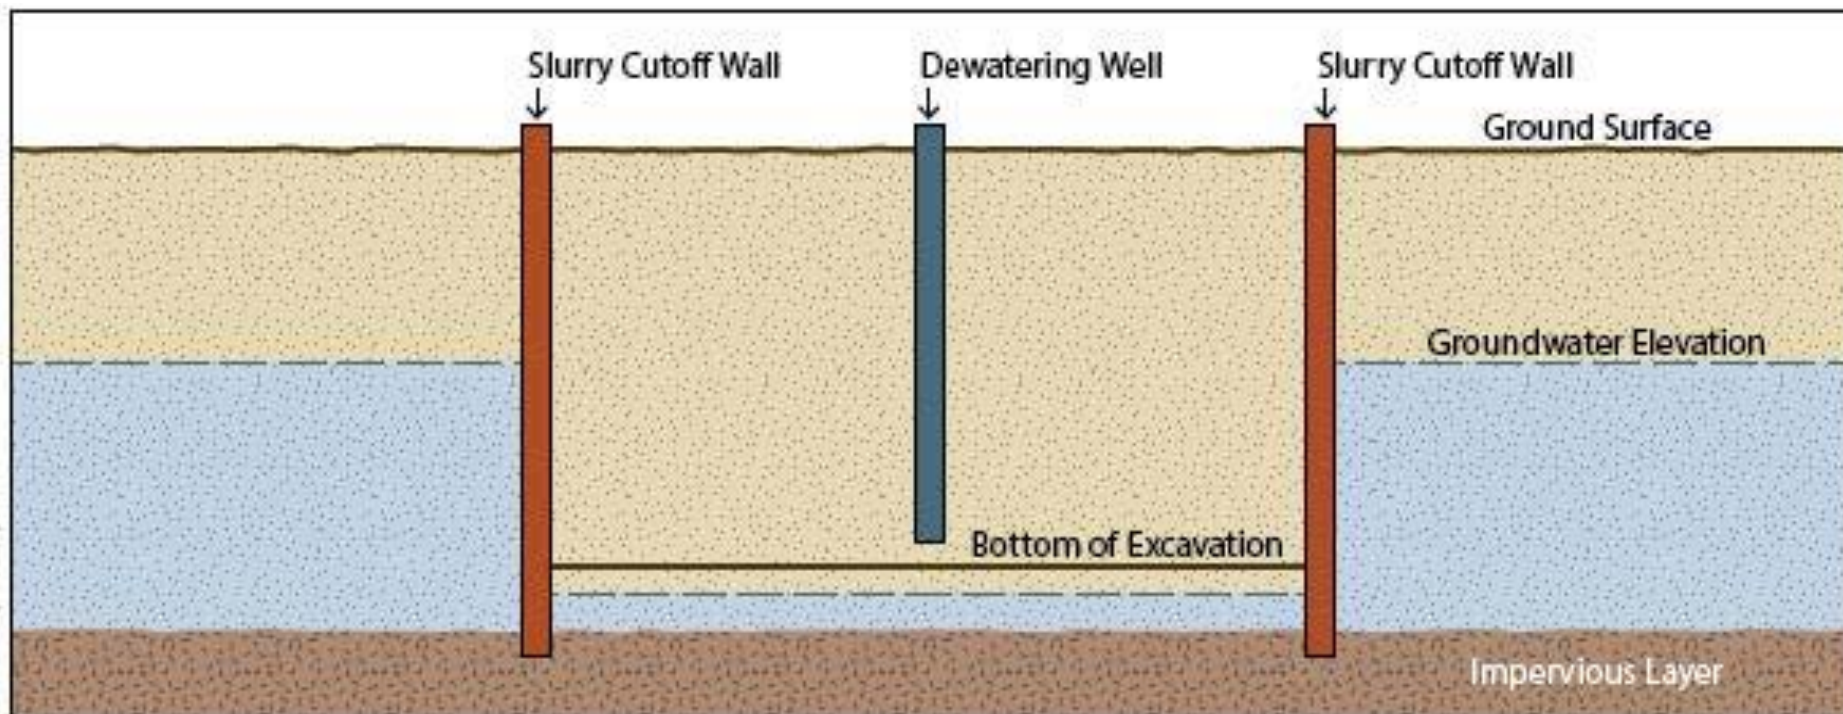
C: Example of Groundwater Elevation During Dewatering Actions with Slurry Cutoff Walls
